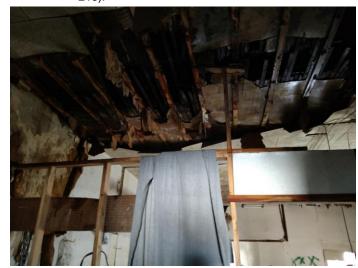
View of first floor water damaged ceilings (building 213).
